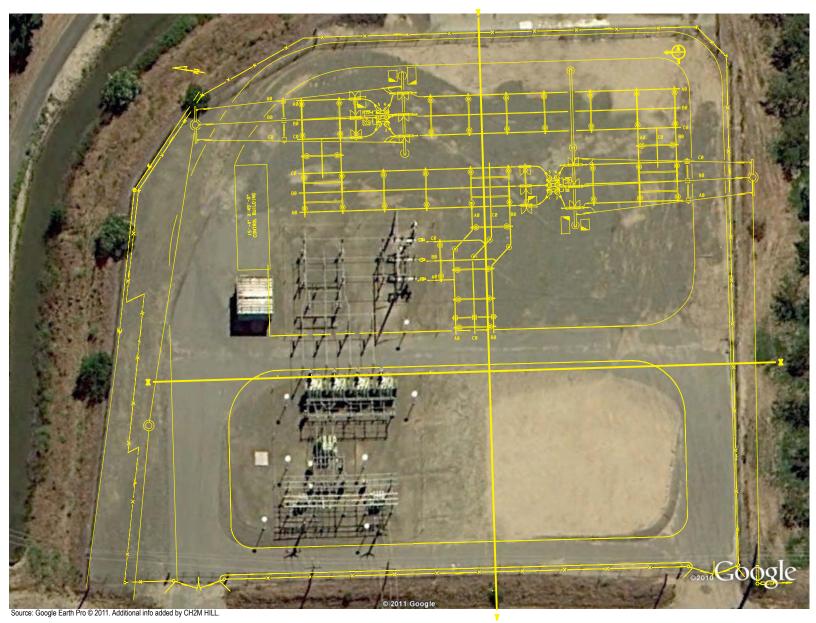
Cressey Substation Existing Aerial View with Proposed Modification Plan View Cressey-Gallo 115 kV Power Line Project
